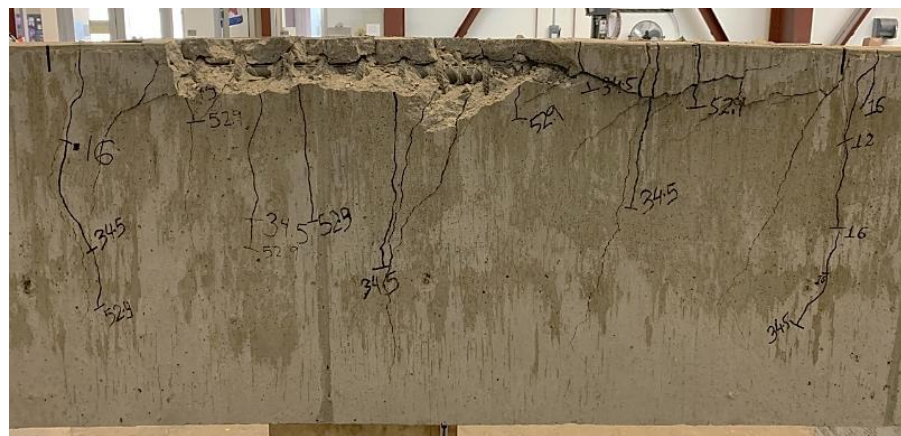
Cracking along transverse reinforcement on tension face (14-b)
